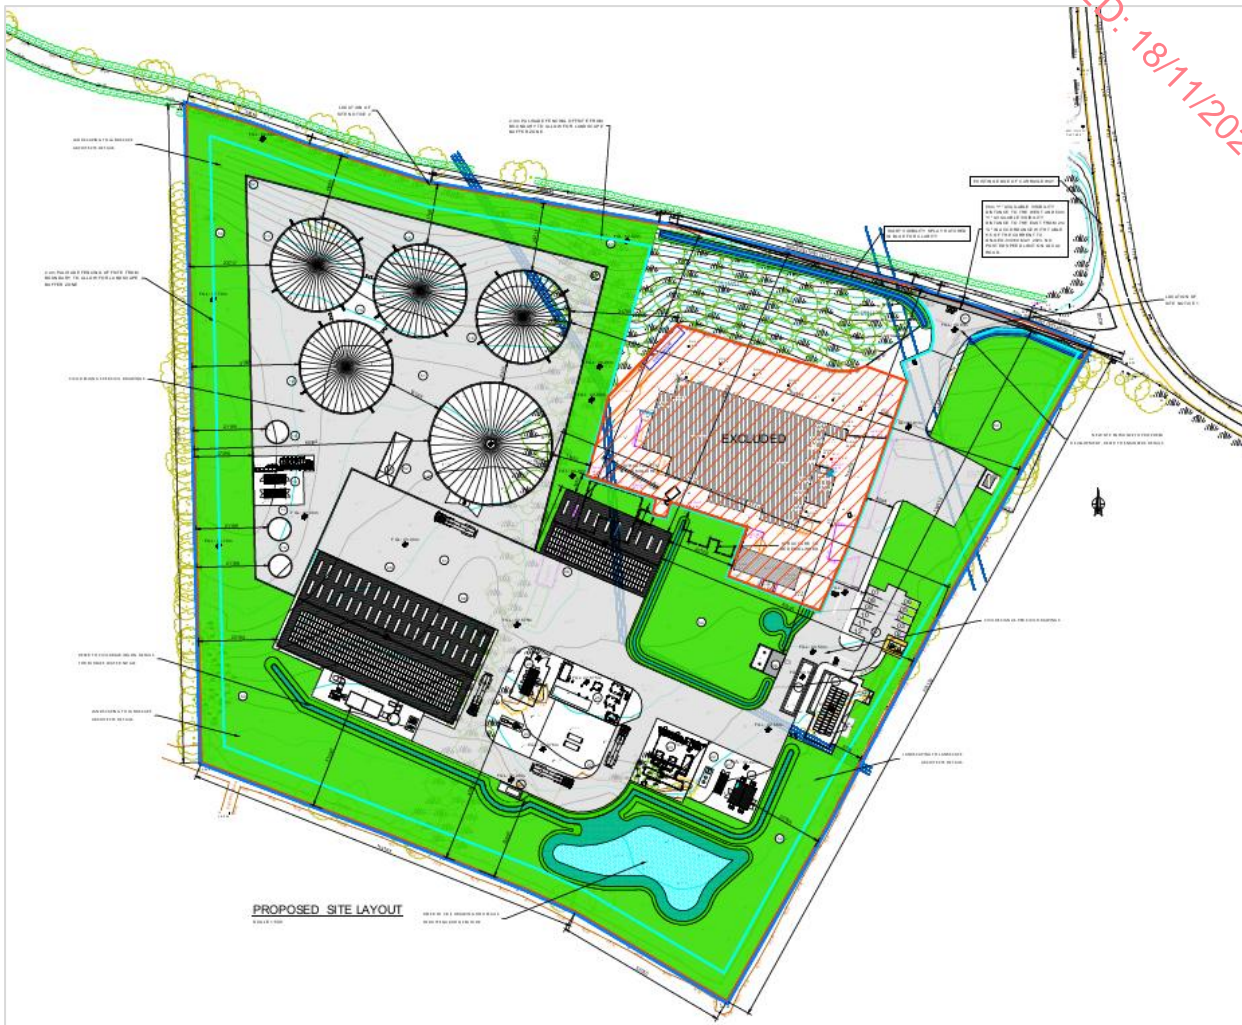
Proposed Site Layout Plan. (ORS Drawing ref: 231240-ORS-ZZ-00-DR-AR-200)
